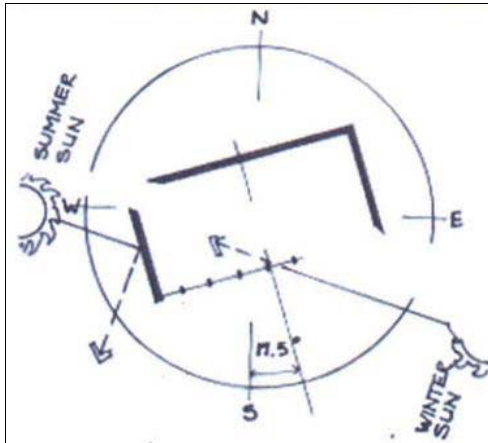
Building direction towards the sun (St. Clair, 2010, p.16)
